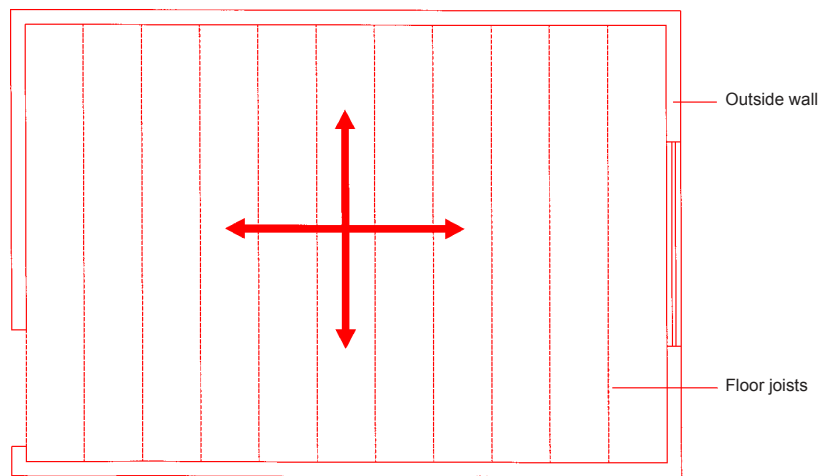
For a wood-finished floor covering, install Quik Trak panels perpendicular to the direction of the finished-wood floor boards.
